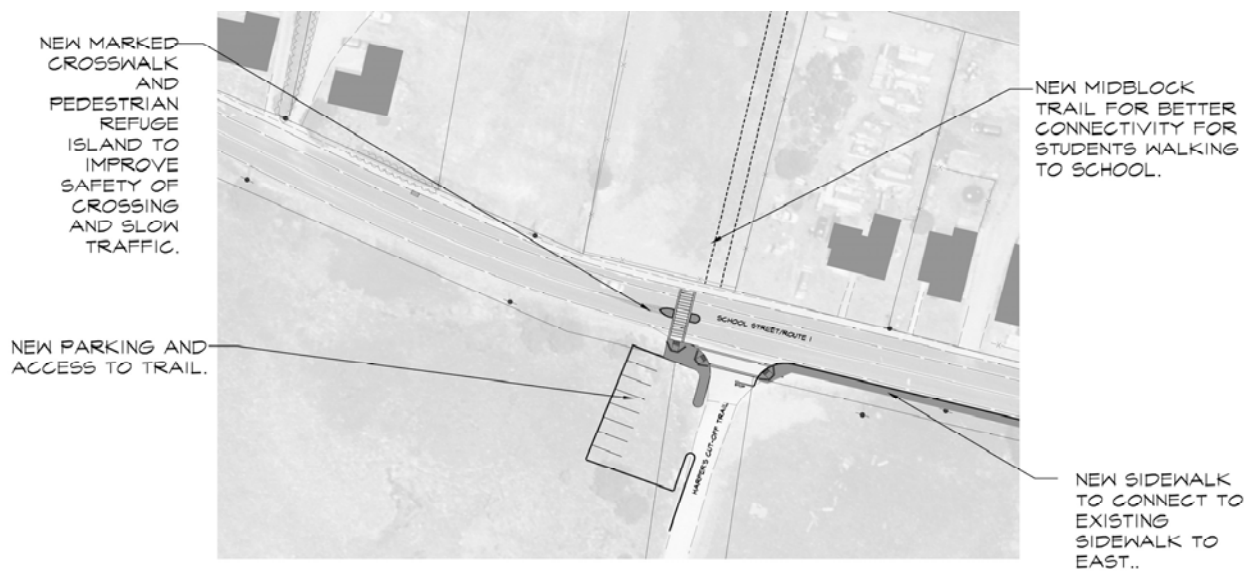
Proposed Crosswalk at Harper’s Trail Head
